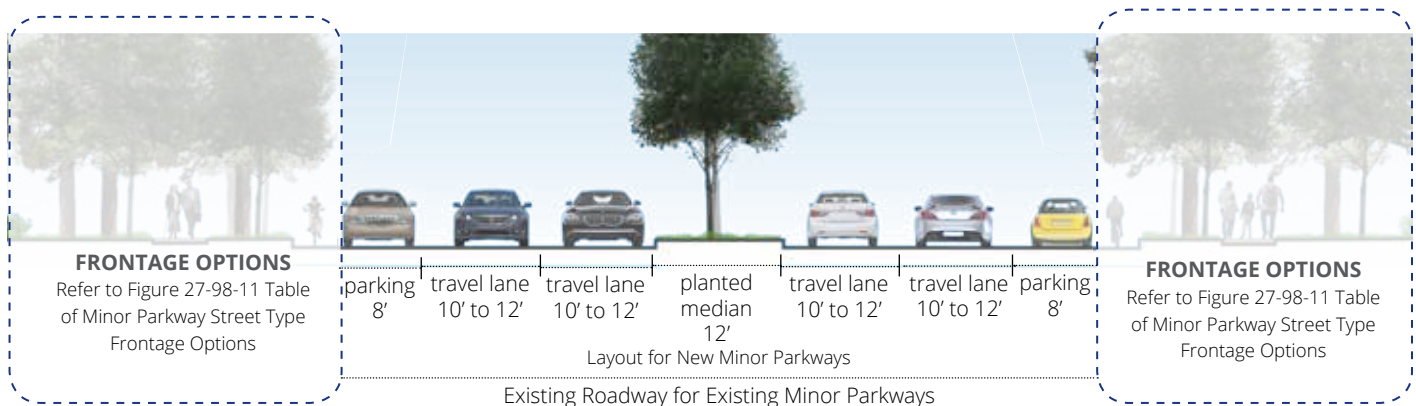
Minor Parkway Street Section - Existing and New
